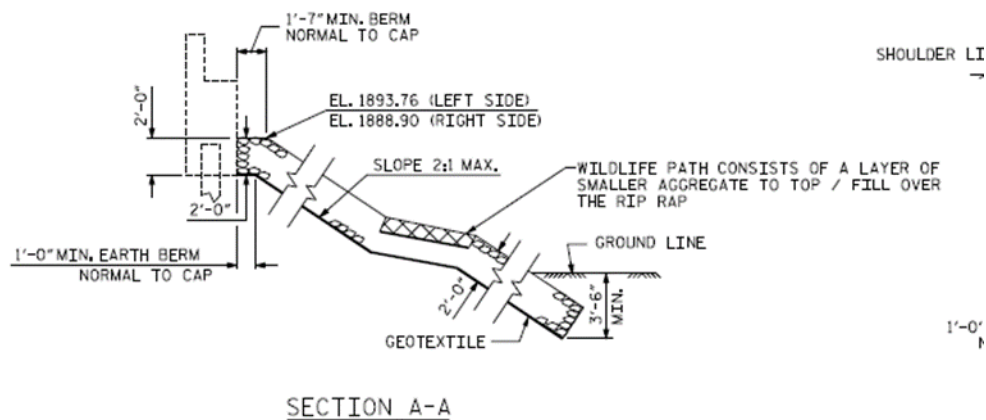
Cross-Section of NCDOT Wildlife Passage, Harmon Run Road
